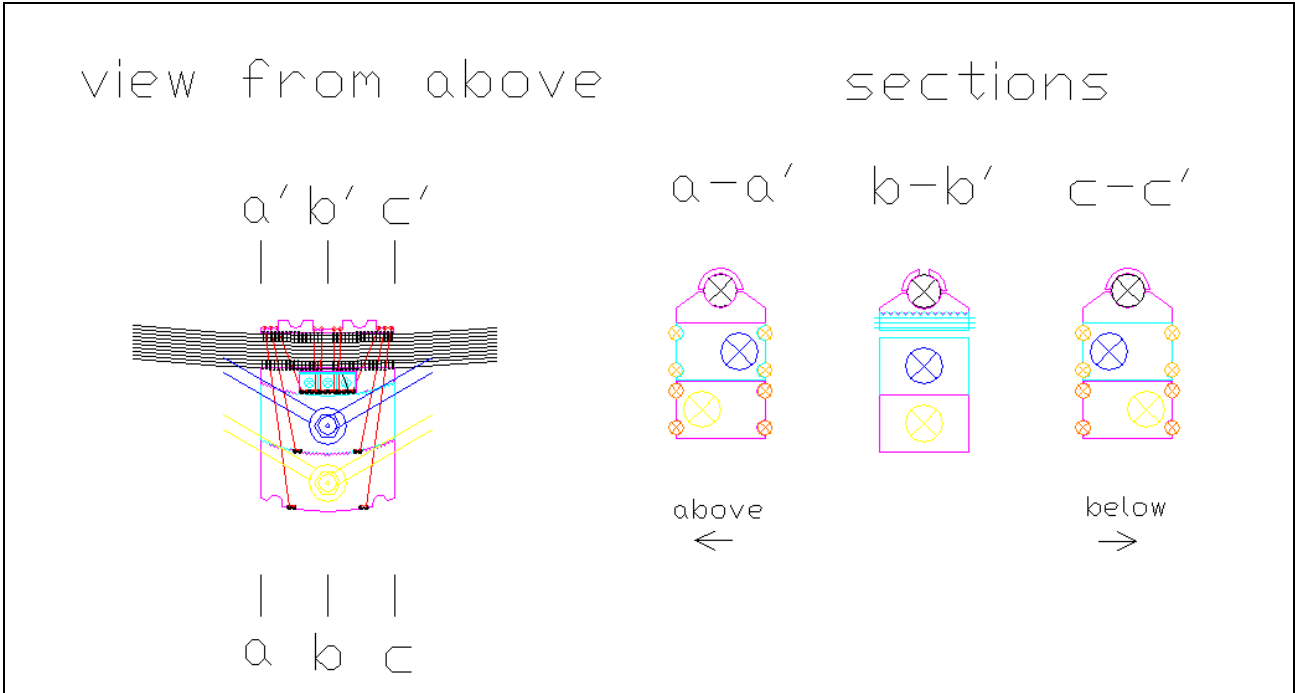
(from ring.dwg) – H: Details of main anchorages (without wing-ring ropes anchorage; views in projection and not in section)
